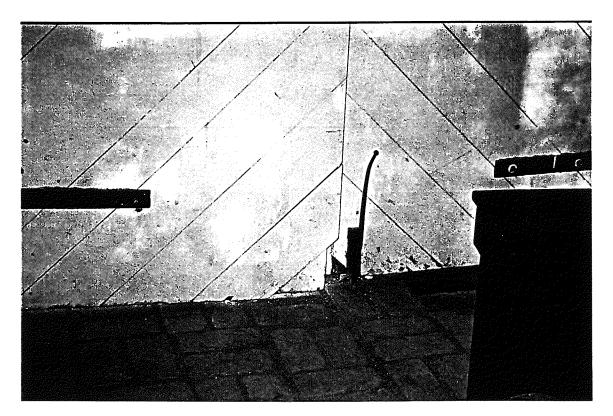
John Brown's Fort, double sheave doors at center bay of north elevation.
